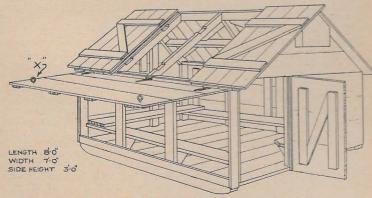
A good type of individual house. Plan No. 10.72-49.
